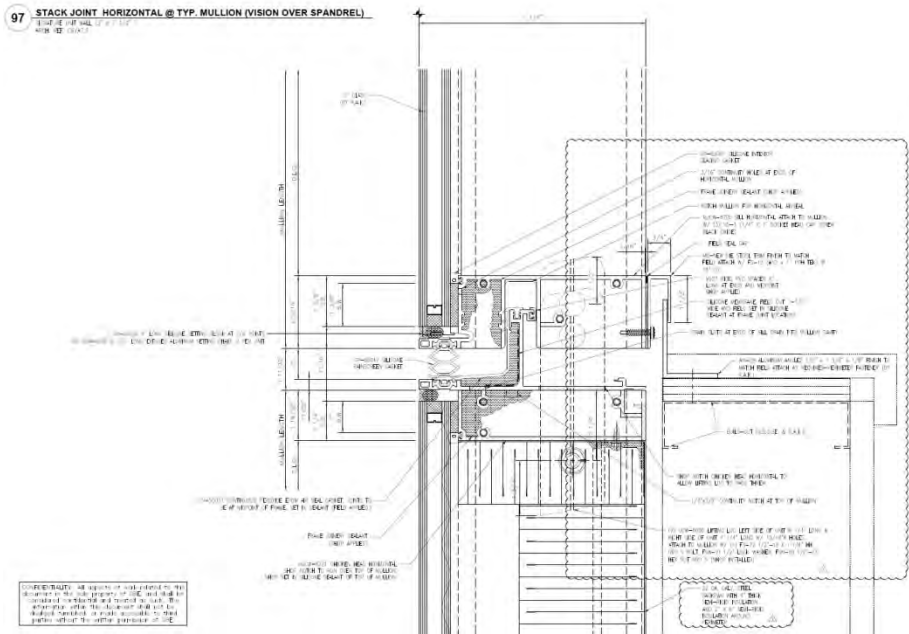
Detail #2. Section of the analyzed stack joint. Drawing 4-179.
